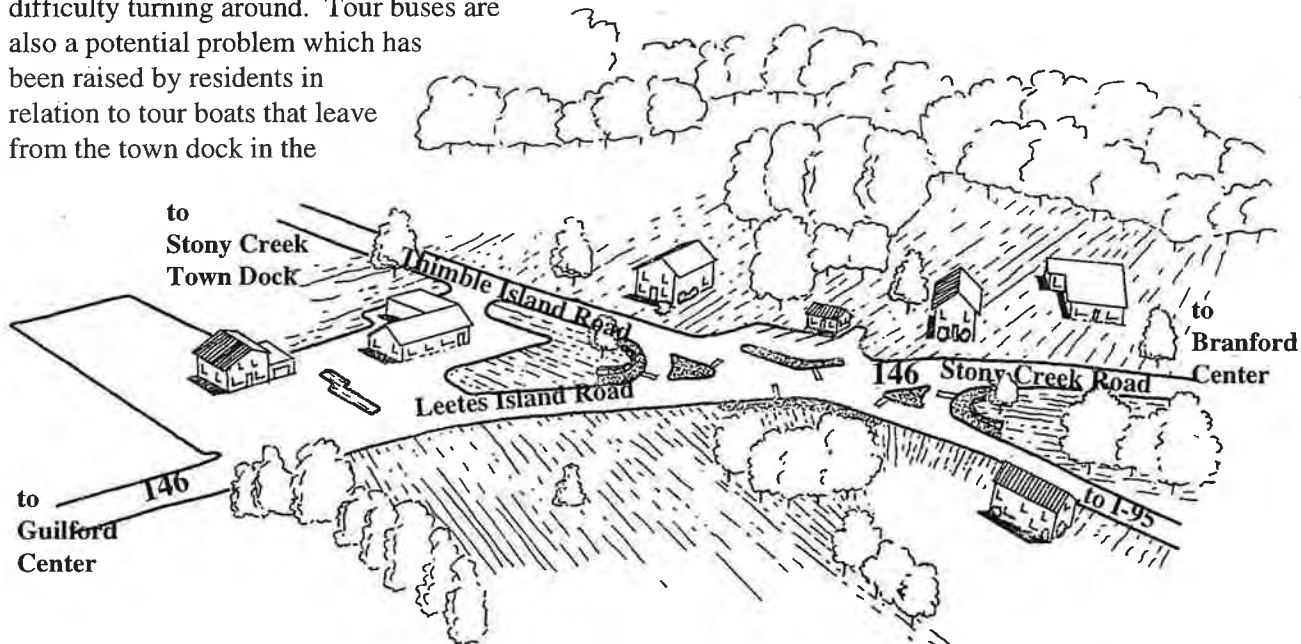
Aerial sketch (looking southwest) of how tightening the geometry and reducing pavement can improve safety and slow speeds at the intersection of Leetes Island Road and Stony Creek Road.
